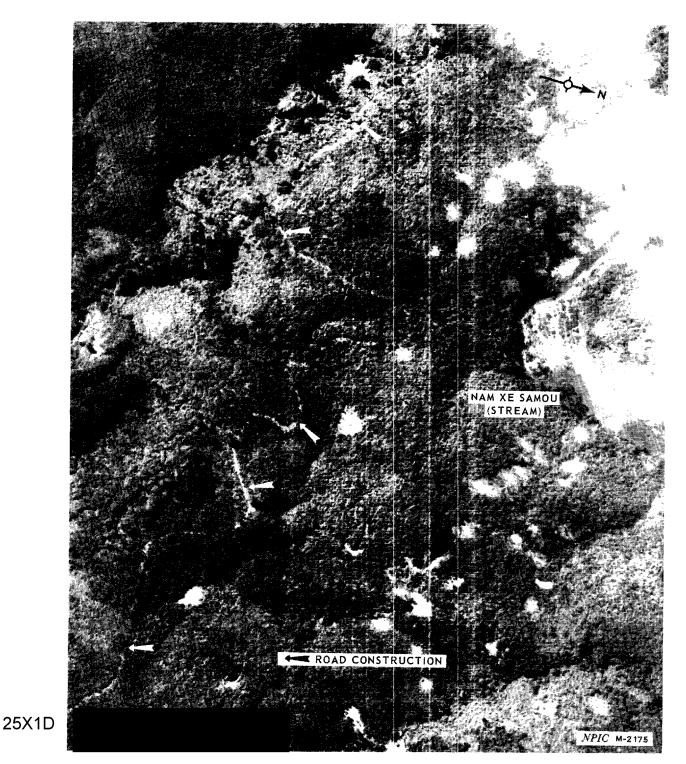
ROAD CONSTRUCTION, ROUTE 92 EXTENSION, LAOS
